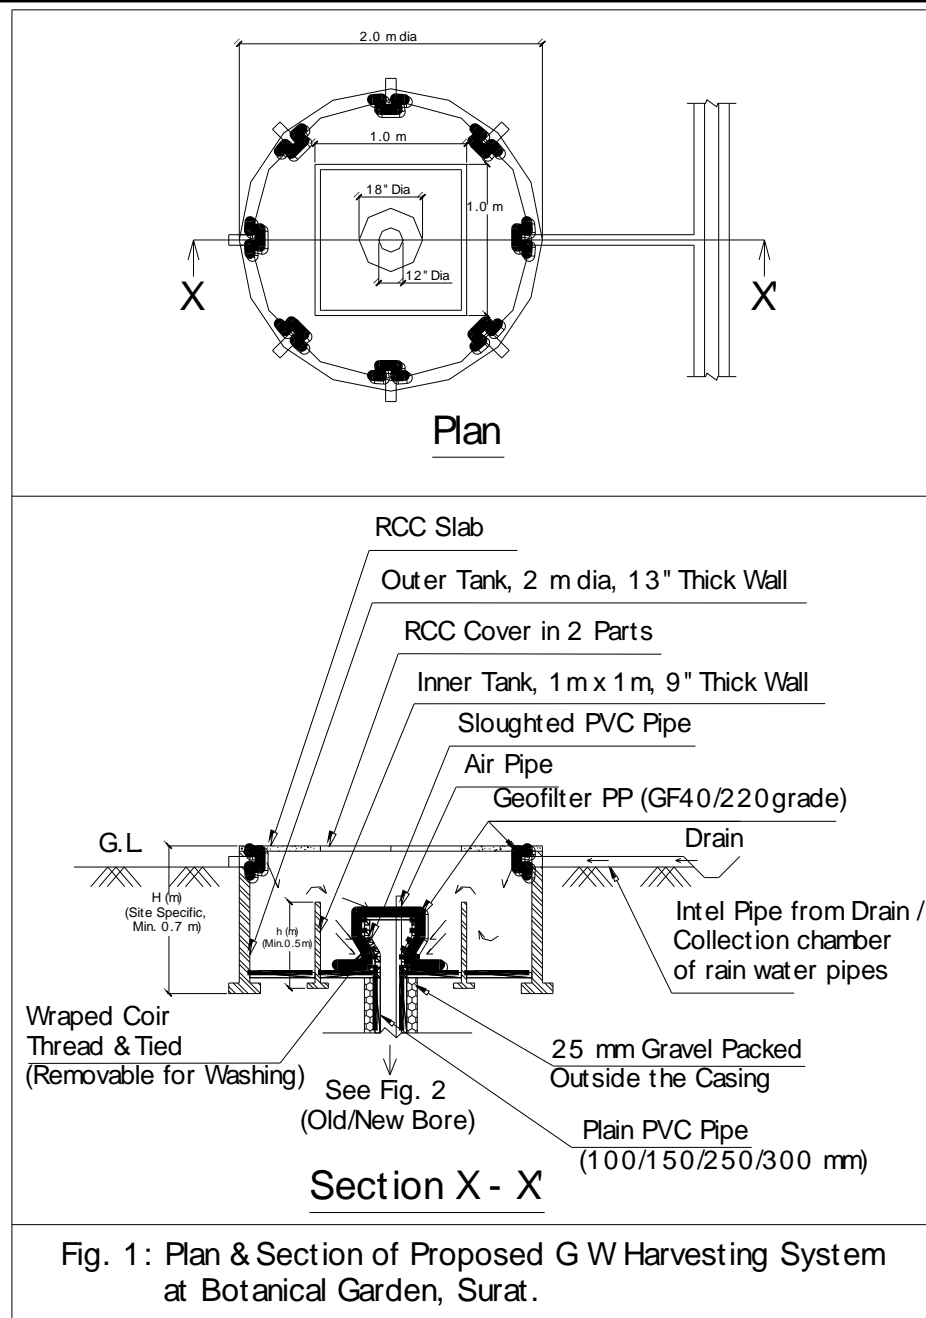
Plan & Section of Proposed G W Harvesting System at Botanical Garden, Surat.
